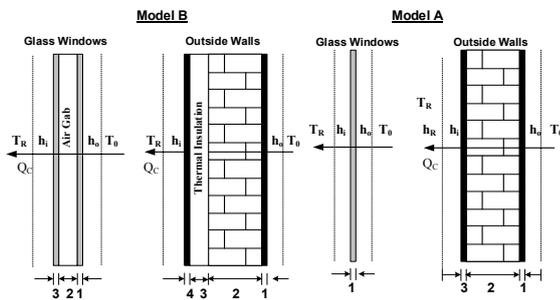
Walls Models A and B with common construction materials and thermal insulation
